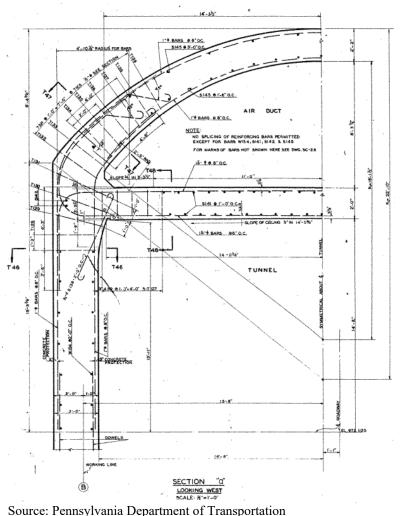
Illustration. Sample tunnel plan sheet (courtesy of Pennsylvania Department of Transportation).
